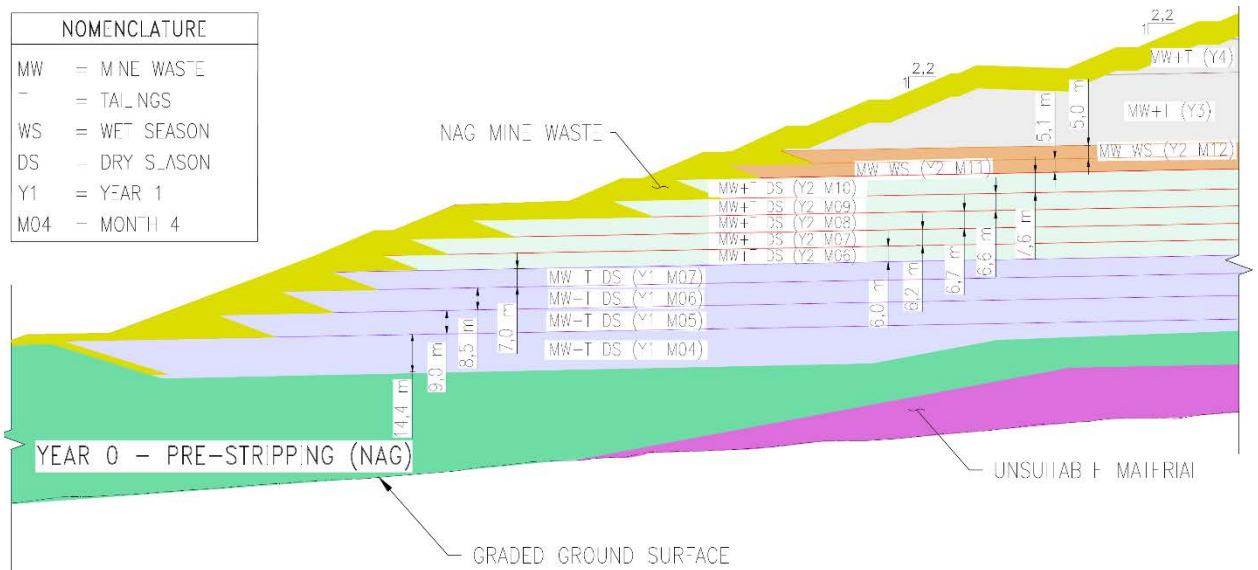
Mine waste-filtered tailings co-disposal - Zone A
